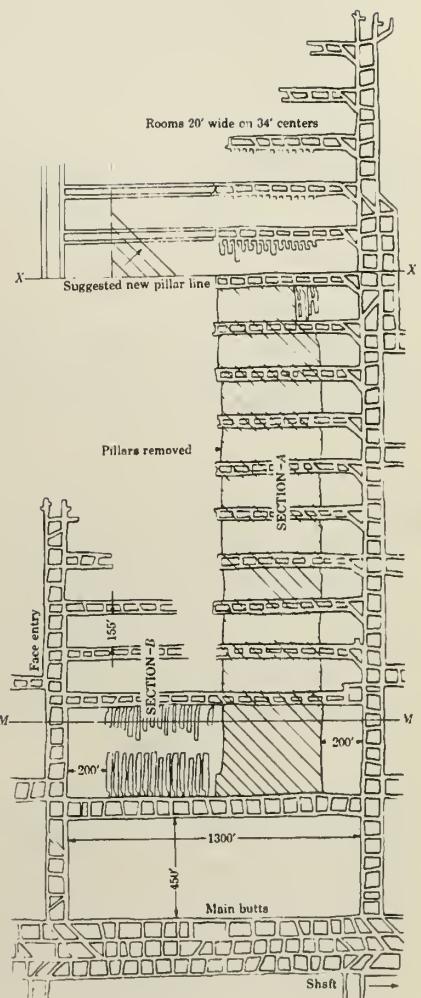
Mining pillars in narrow panels with suggested method for improvement.
